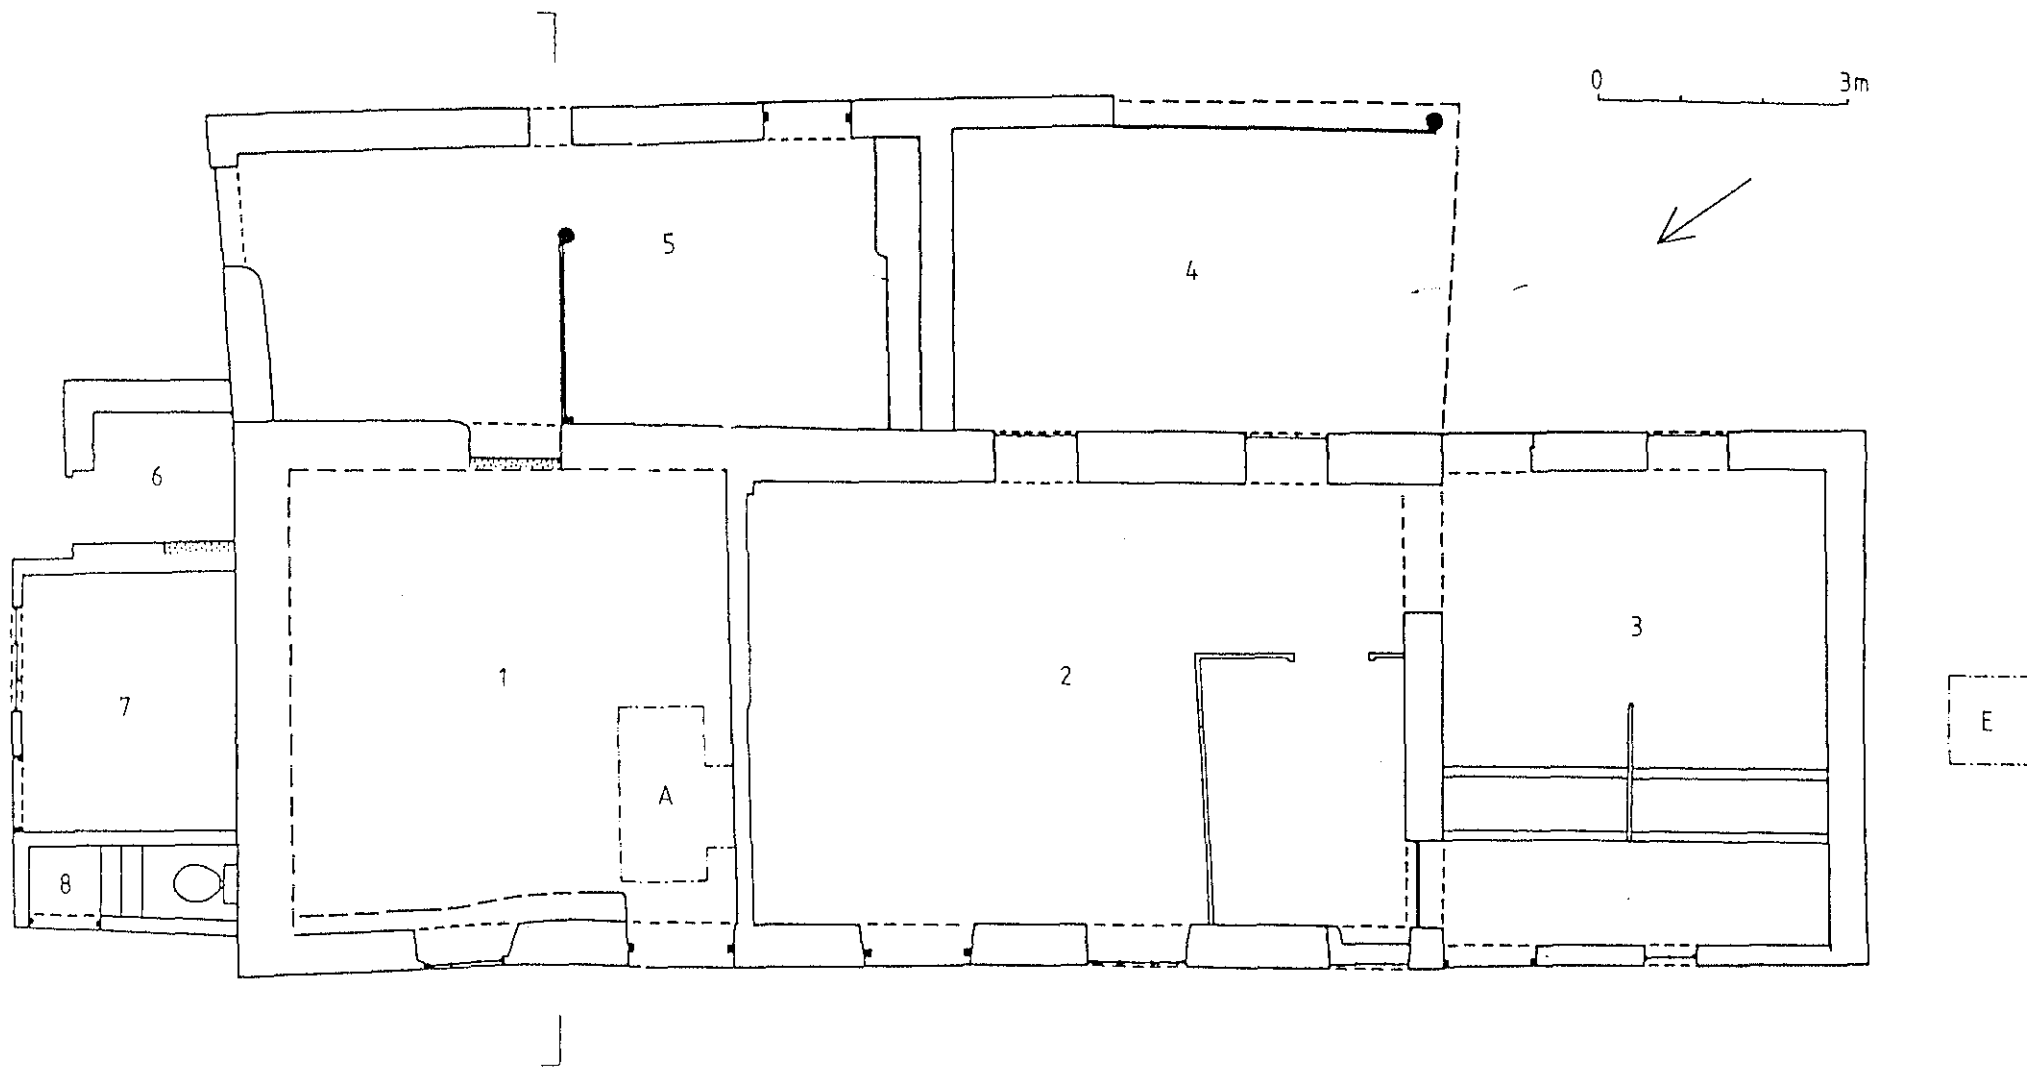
Plan of the Large Barn (Structure 2) at Ship Farm showing the room numbering and location of trenches A and E.
